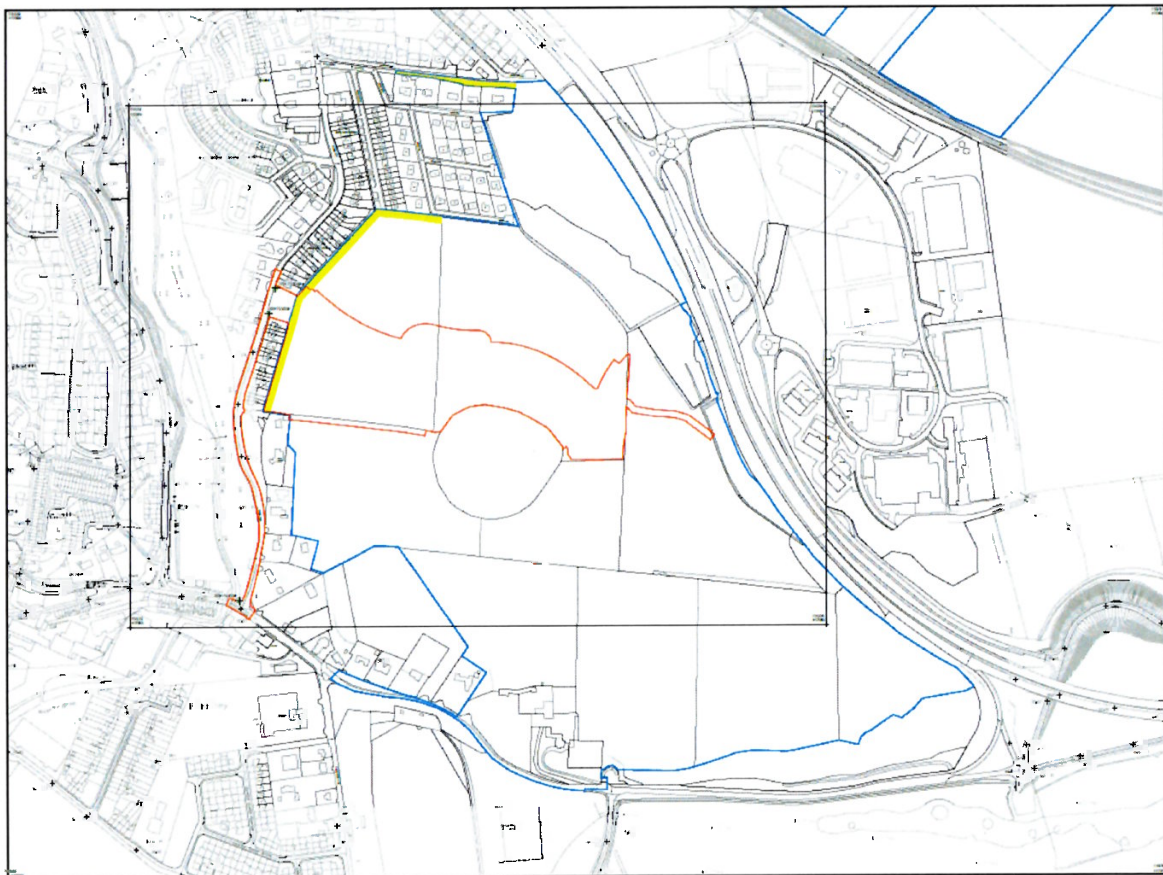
Site location outlined in red (Source: CCK Architects, 2024)
